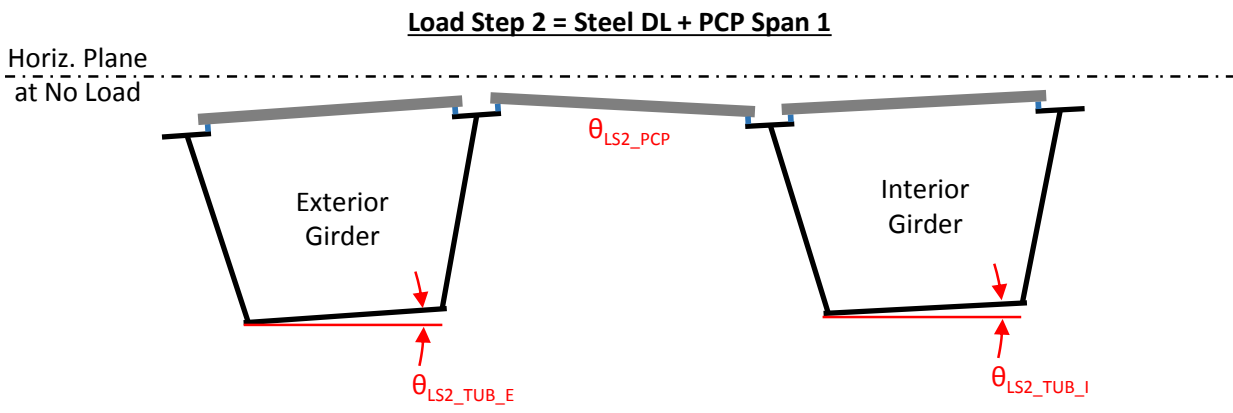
Load Step 2 – Unconnected Steel Tub Girder Twist – Section A-A
